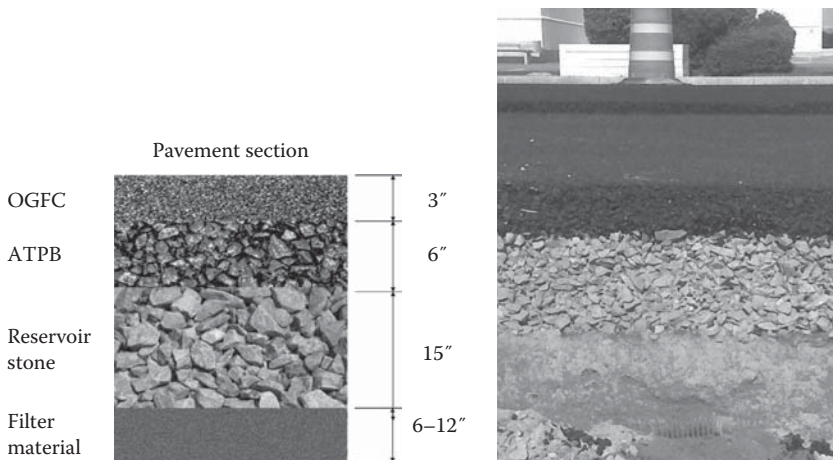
Pervious pavement cross section. (Courtesy of Richard Bradbury, Maine Department of Transportation, Augusta, ME.)
